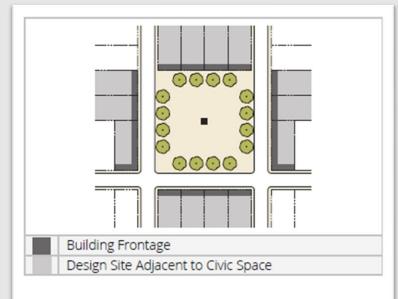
Building Frontage Adjacent to a Civic Space
